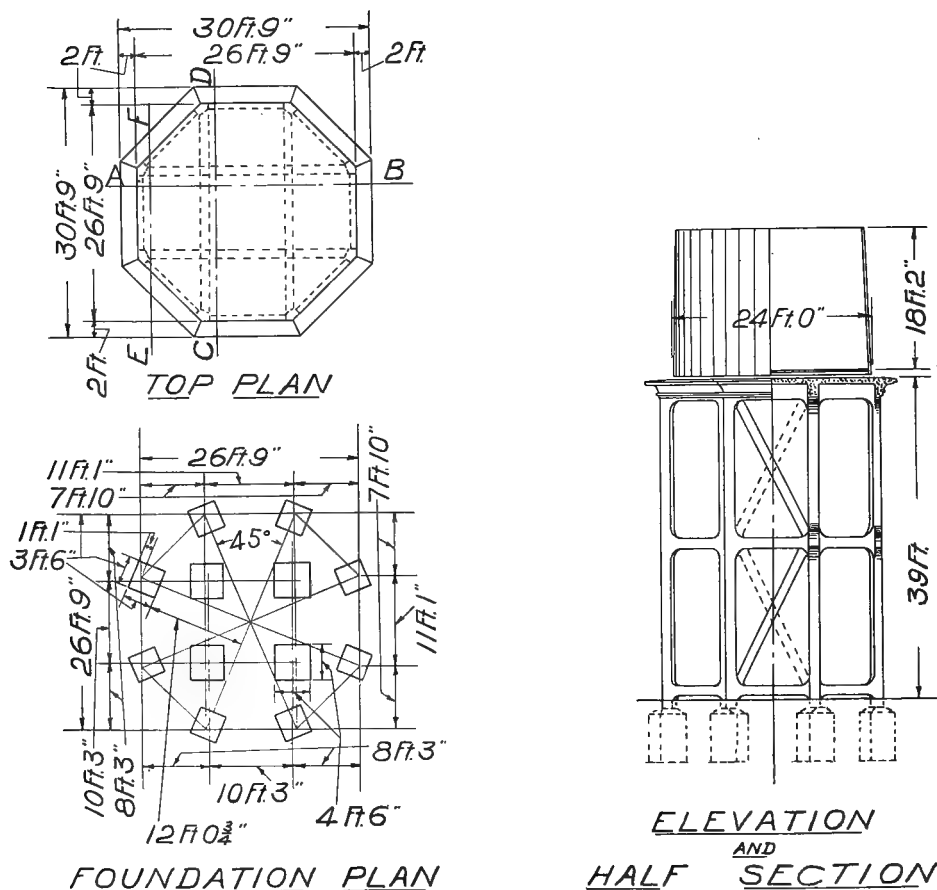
PLAN, HALF SECTION AND HALF ELEVATION WATER TANK SUPPORT, N. Y., N. H. & H. R. R.
